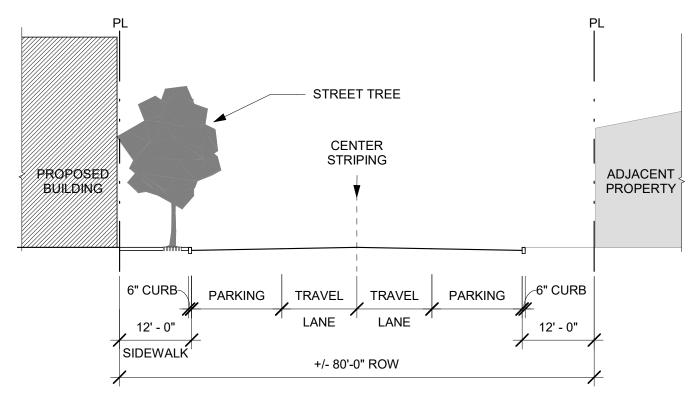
EXHIBIT E - STREETSCAPE OVERVIEW - COMPLETED PLAN
